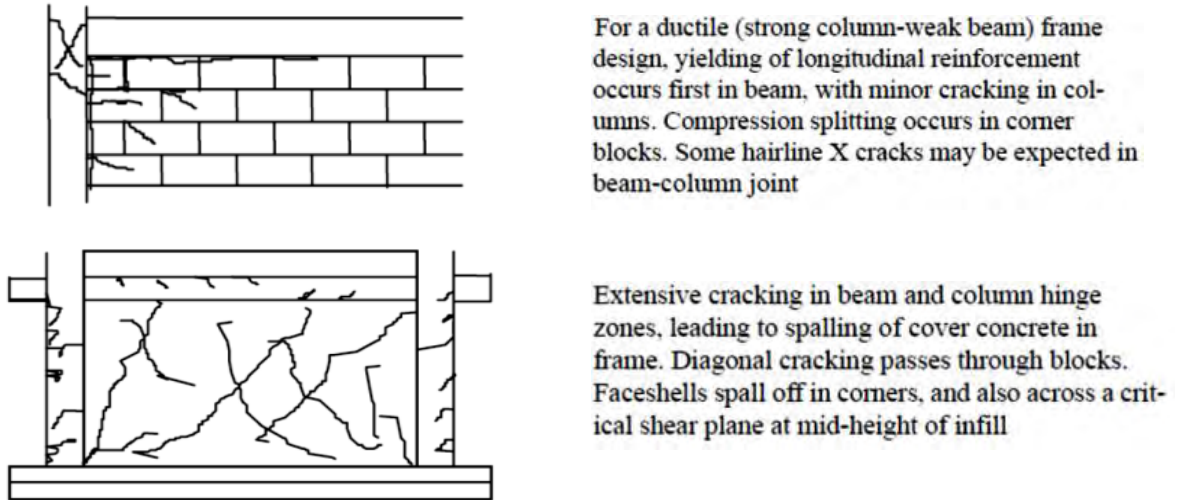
Typical degree of damage for both corner crushing and diagonal cracking (FEMA 306, 1998).
